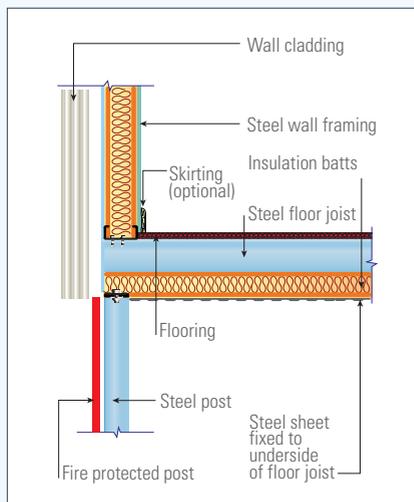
Suspended steel floor system, unenclosed, BAL-FZ
